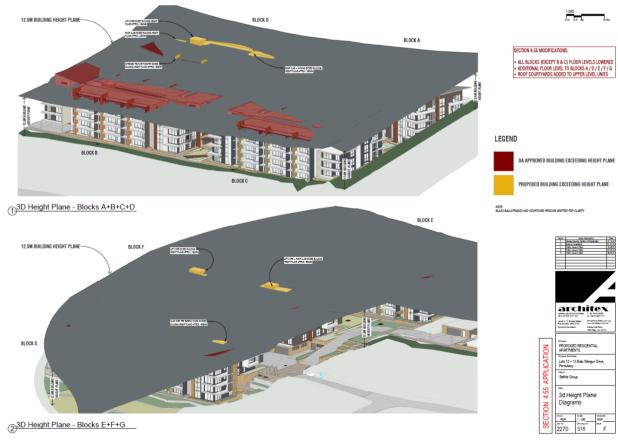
3D Height Plane Diagram showing portions of buildings exceeding the 12.5m height standard as approved in red and as proposed as part of subject modification in yellow (Drawing No. S18, Issue F, prepared by Architex, dated 1/10/2020)
